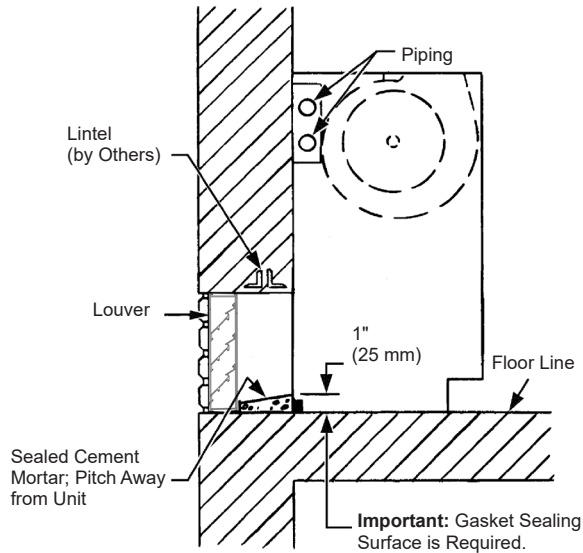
16-5/8" (422 mm) Deep Unit with Open Pipe Tunnel & High Louver Application with Chased Wall
